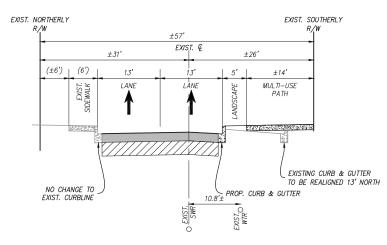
Kurtz Street - Street Section (2-Lane Collector - 2-way)
